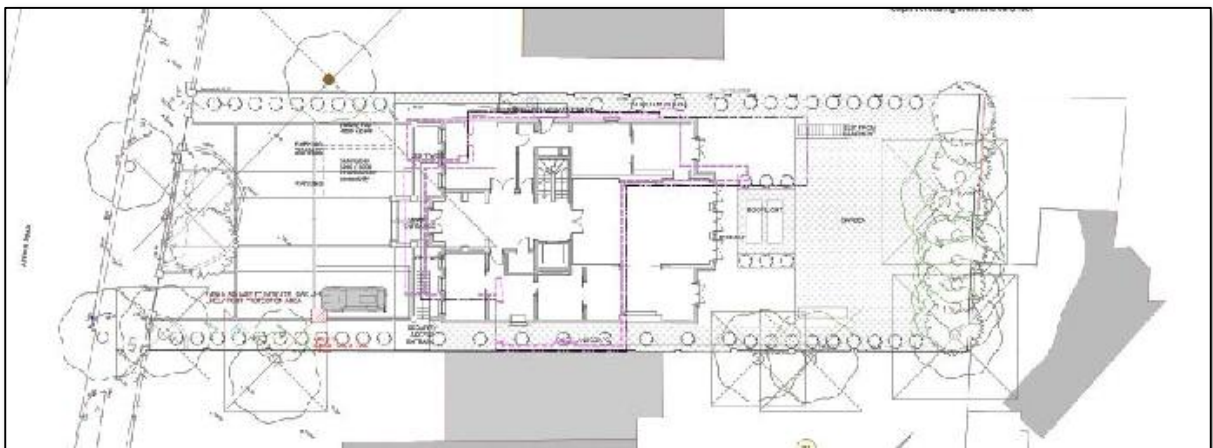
Extract of Plan 4, Proposed Site Plan.
